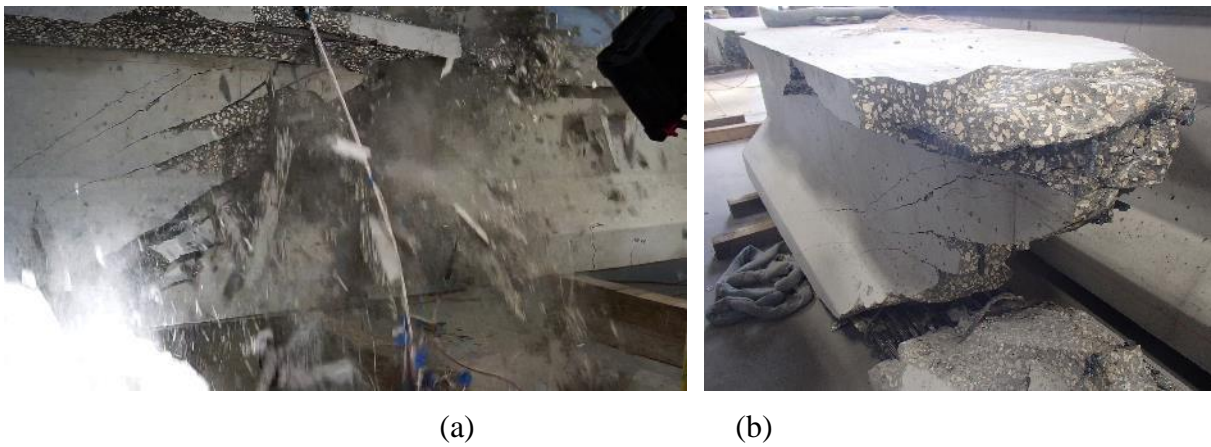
Specimen SS4 (a) video screenshot at failure (b) half specimen after test
